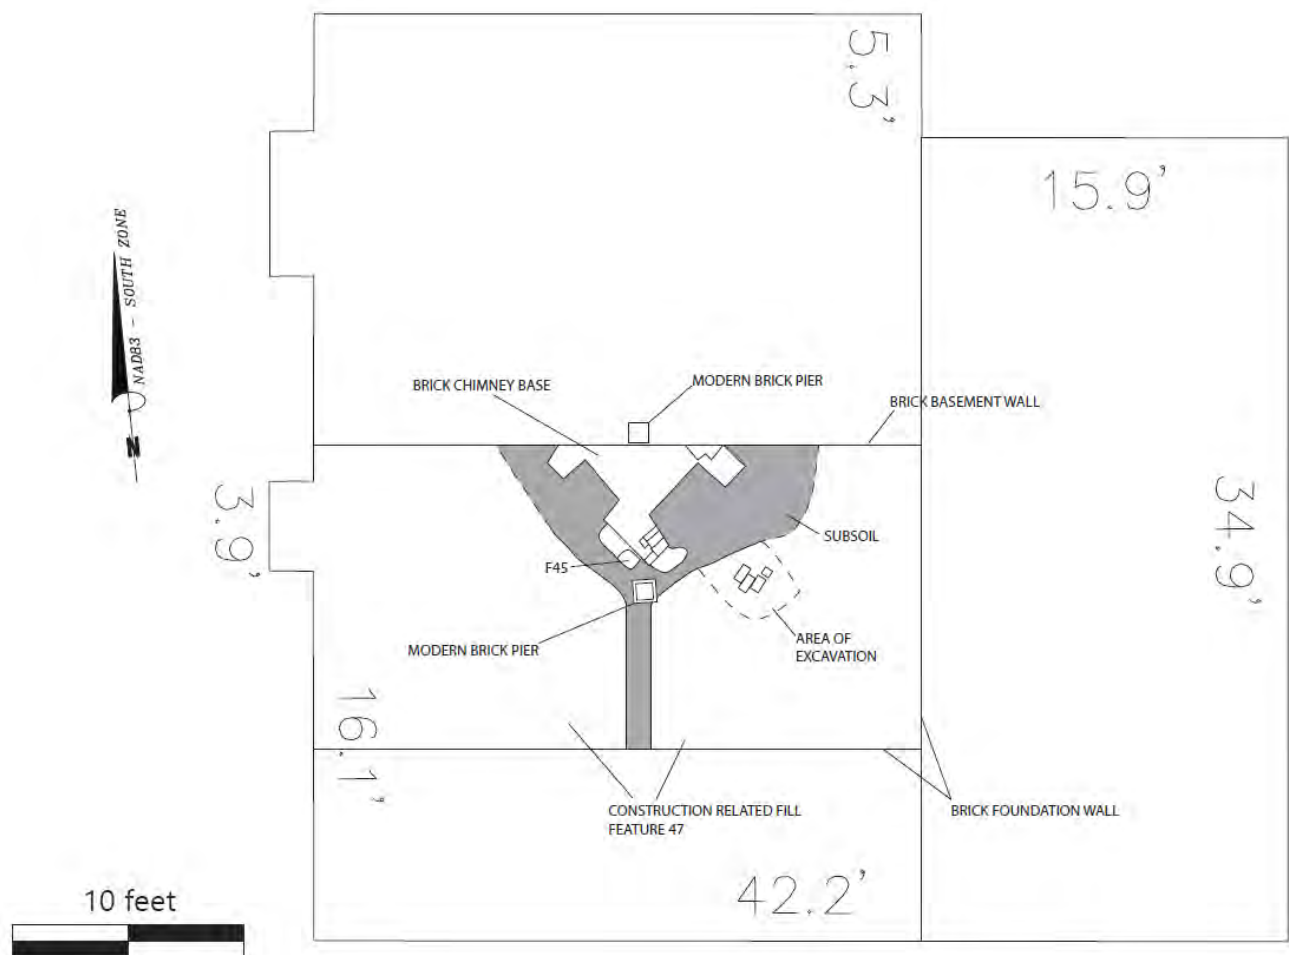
Plan view of excavations around chimney base beneath the southwestern room of Spring Hill.
